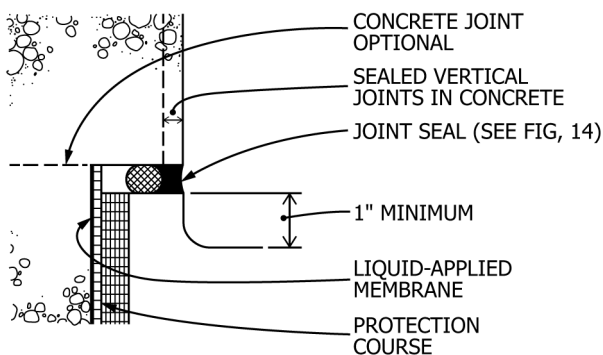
Terminal Condition Above Finish Grade on Concrete Wall (see 7.6.1)
